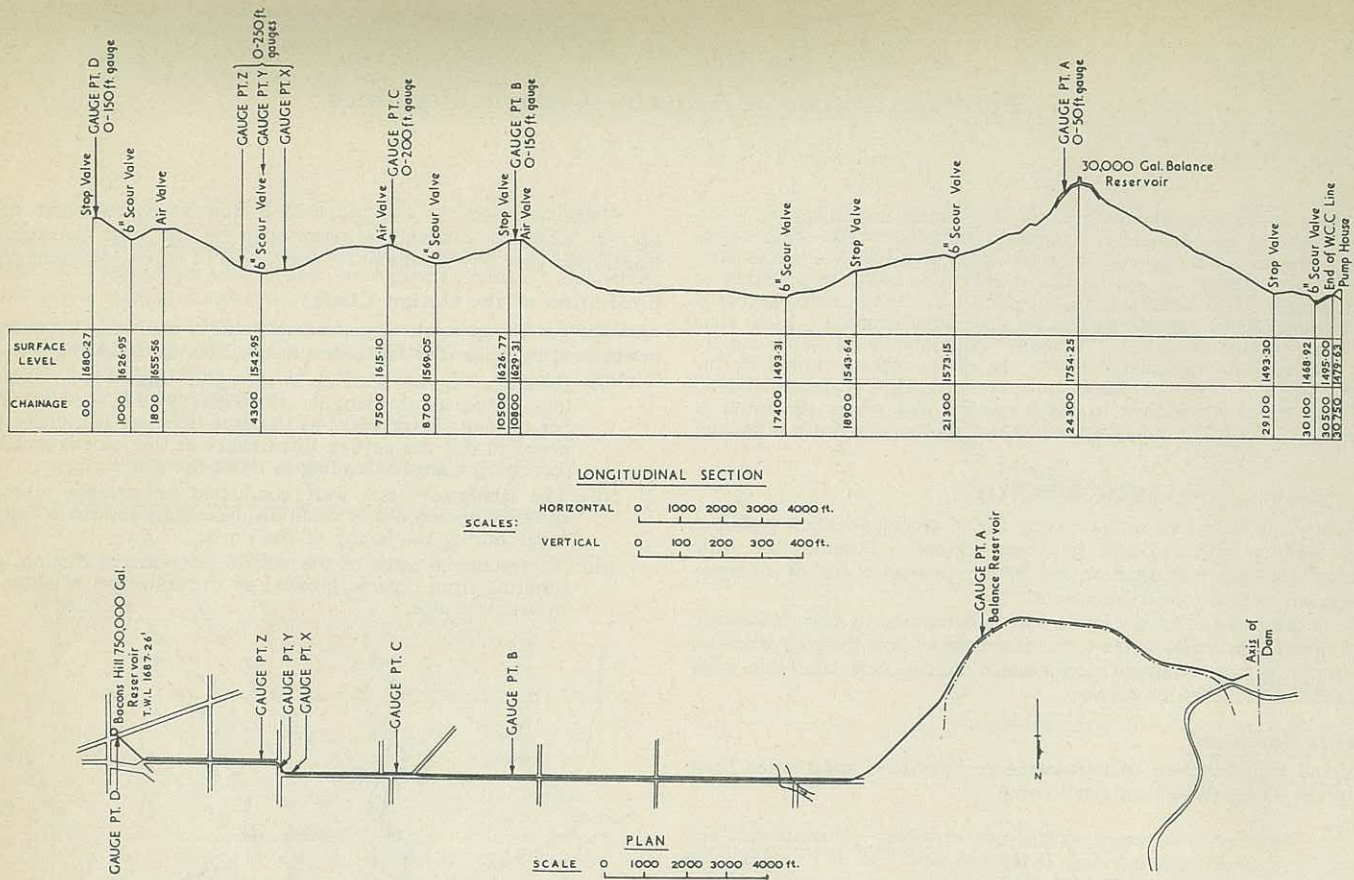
Warwick Pipe Friction Tests—Pipe Details—21-in. Pipeline.
